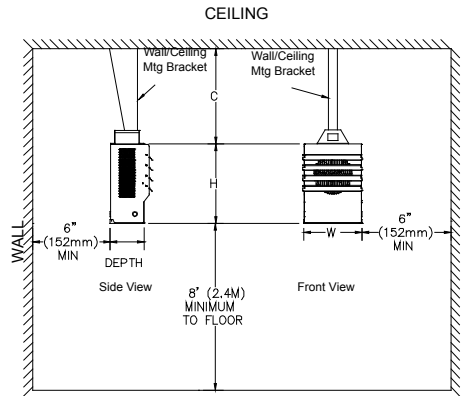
HORIZONTAL CEILING MOUNT WITH MTG ARM
